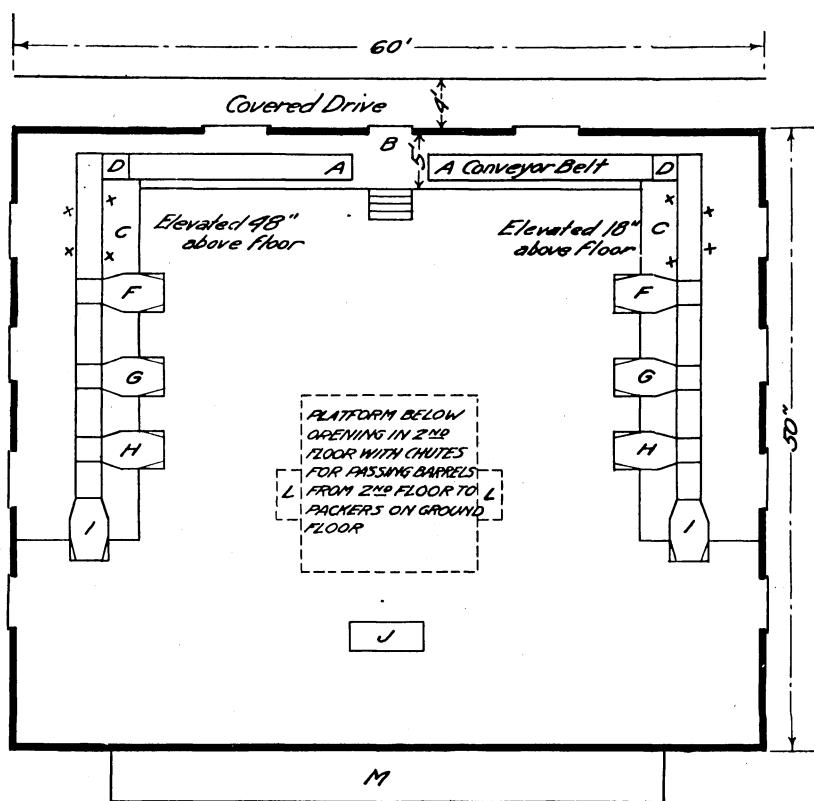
Plan 3: Floor plan for a well-arranged house capable of handling 1,000 barrels daily.
